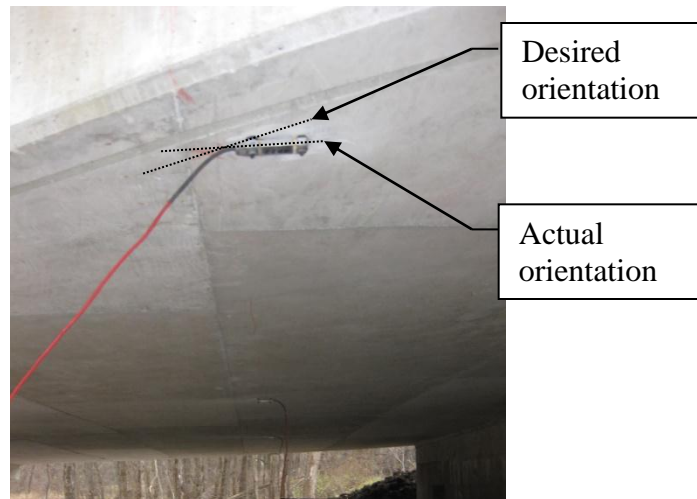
Installation error for strain transducers attached to bottom of bridge deck in BC
